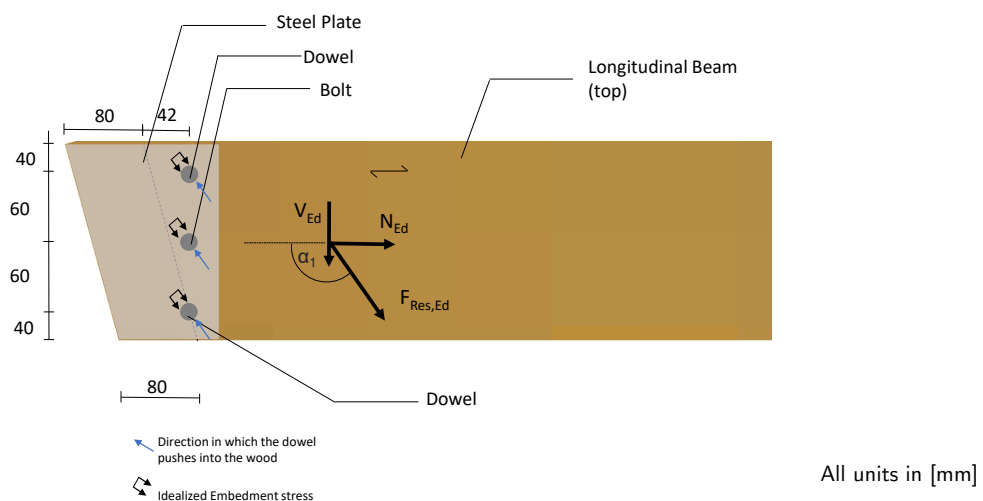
Connection II-B Joist Hanger with Fasteners
